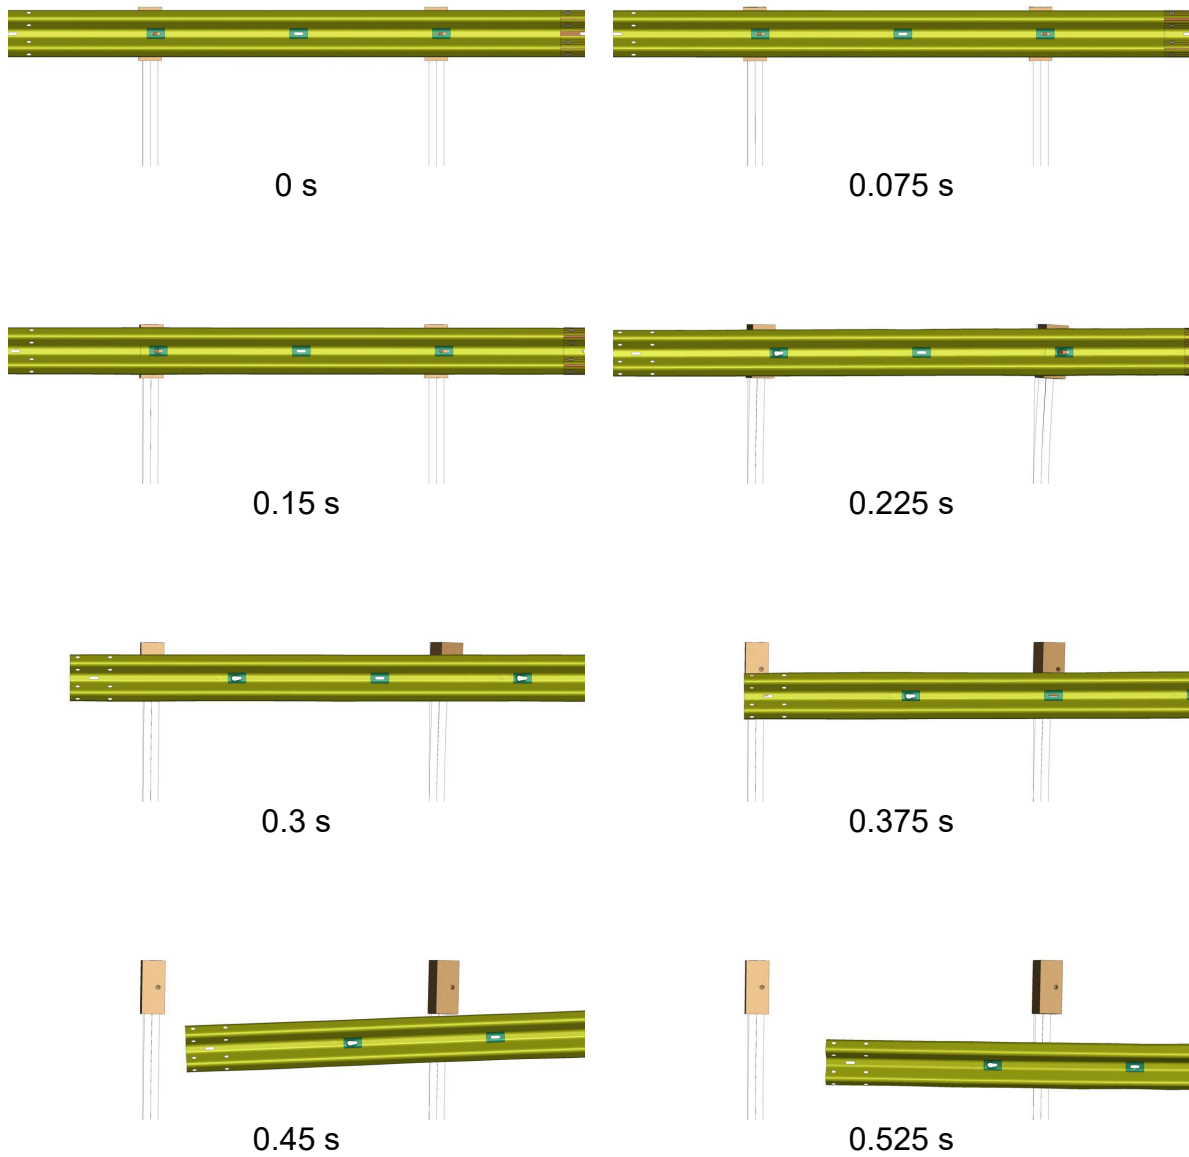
187.5-ft Guardrail System with Refined Slot – Front View of Downstream Posts During *MASH* Test 3-11
